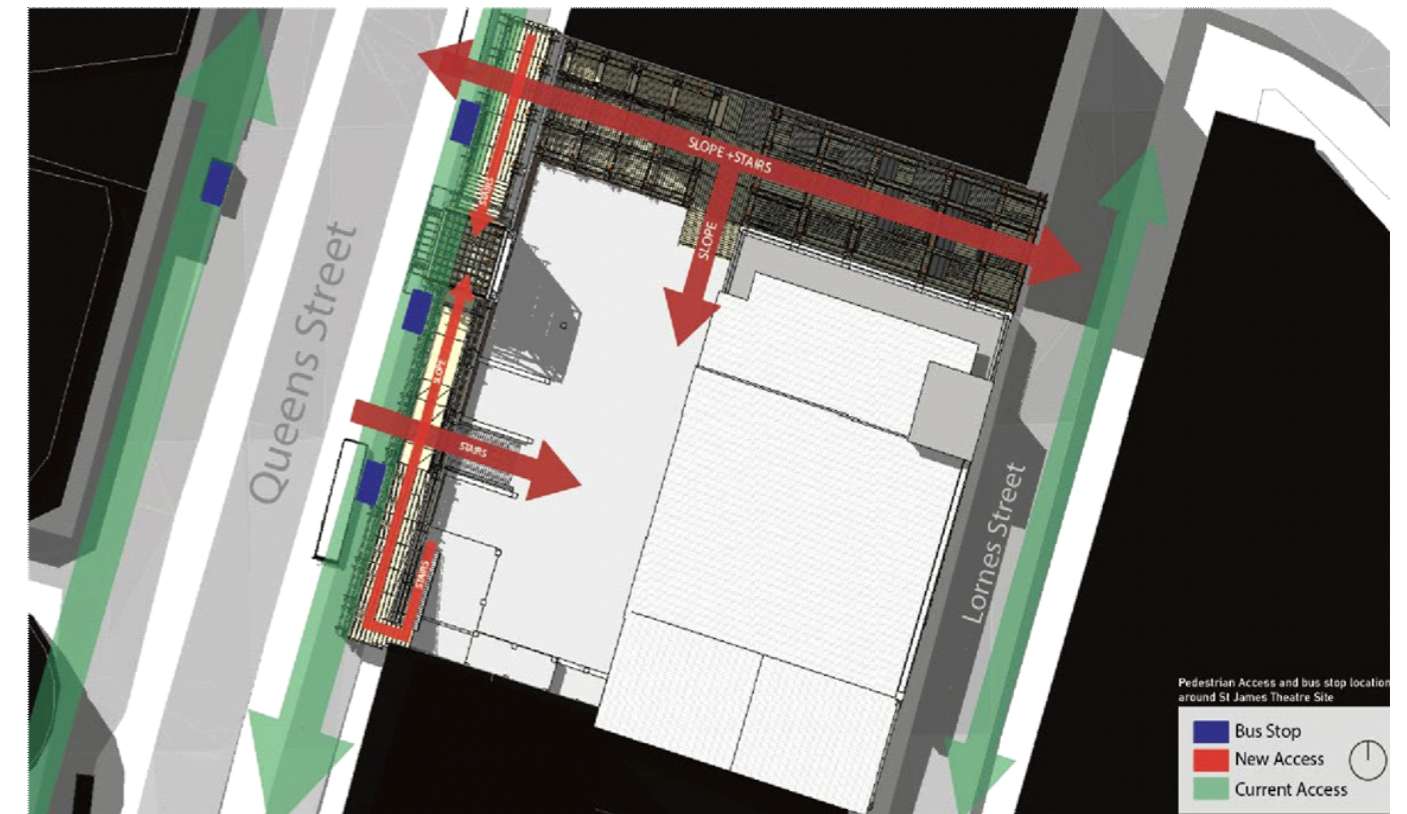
Accessibility Map on the project site and the surrounding streets. 2025
